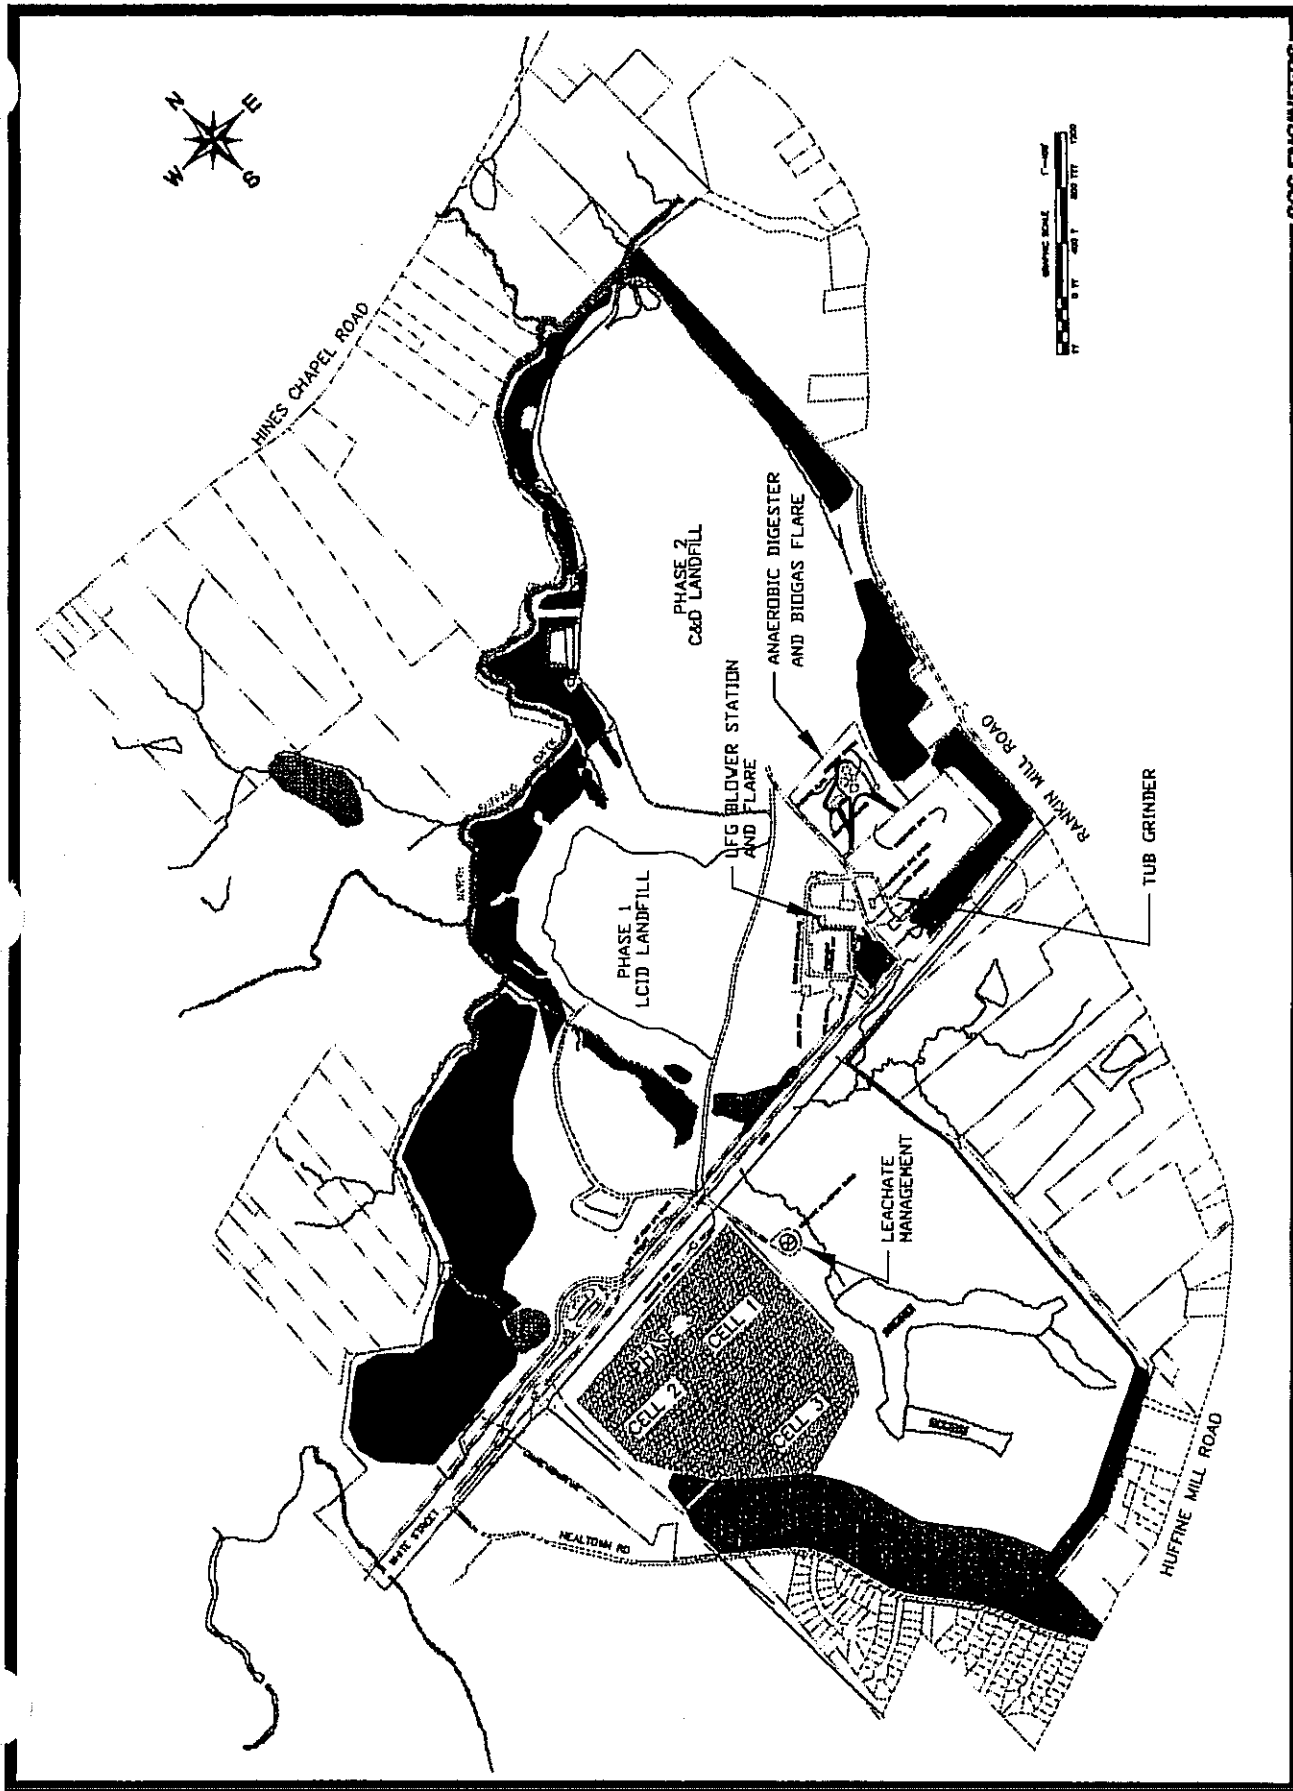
A. WHITE STREET LANDFILL SITE PLAN
